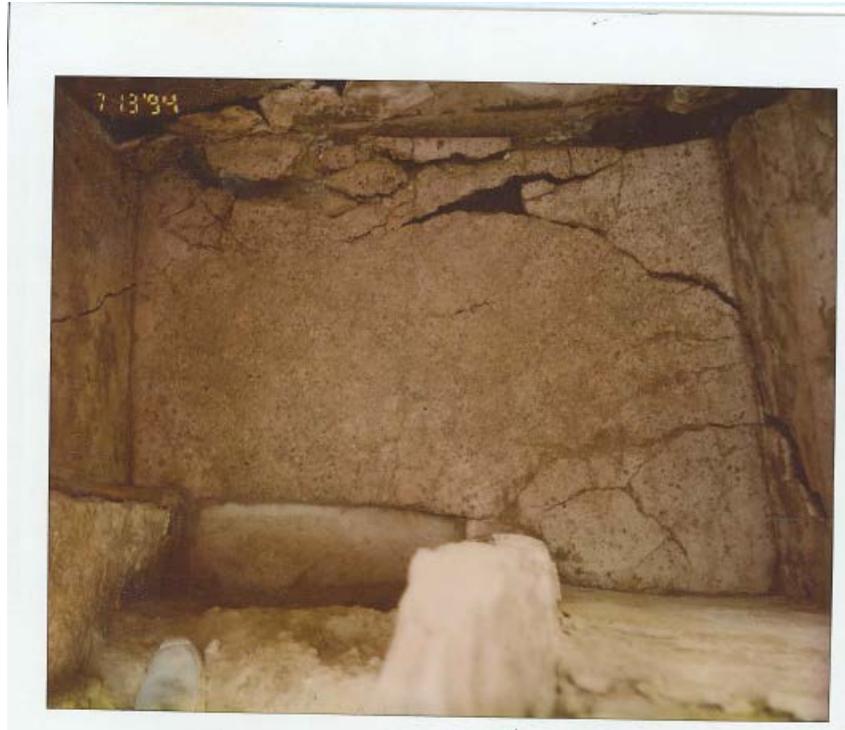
Floor of Mini-Columbarium, looking toward south wall.
